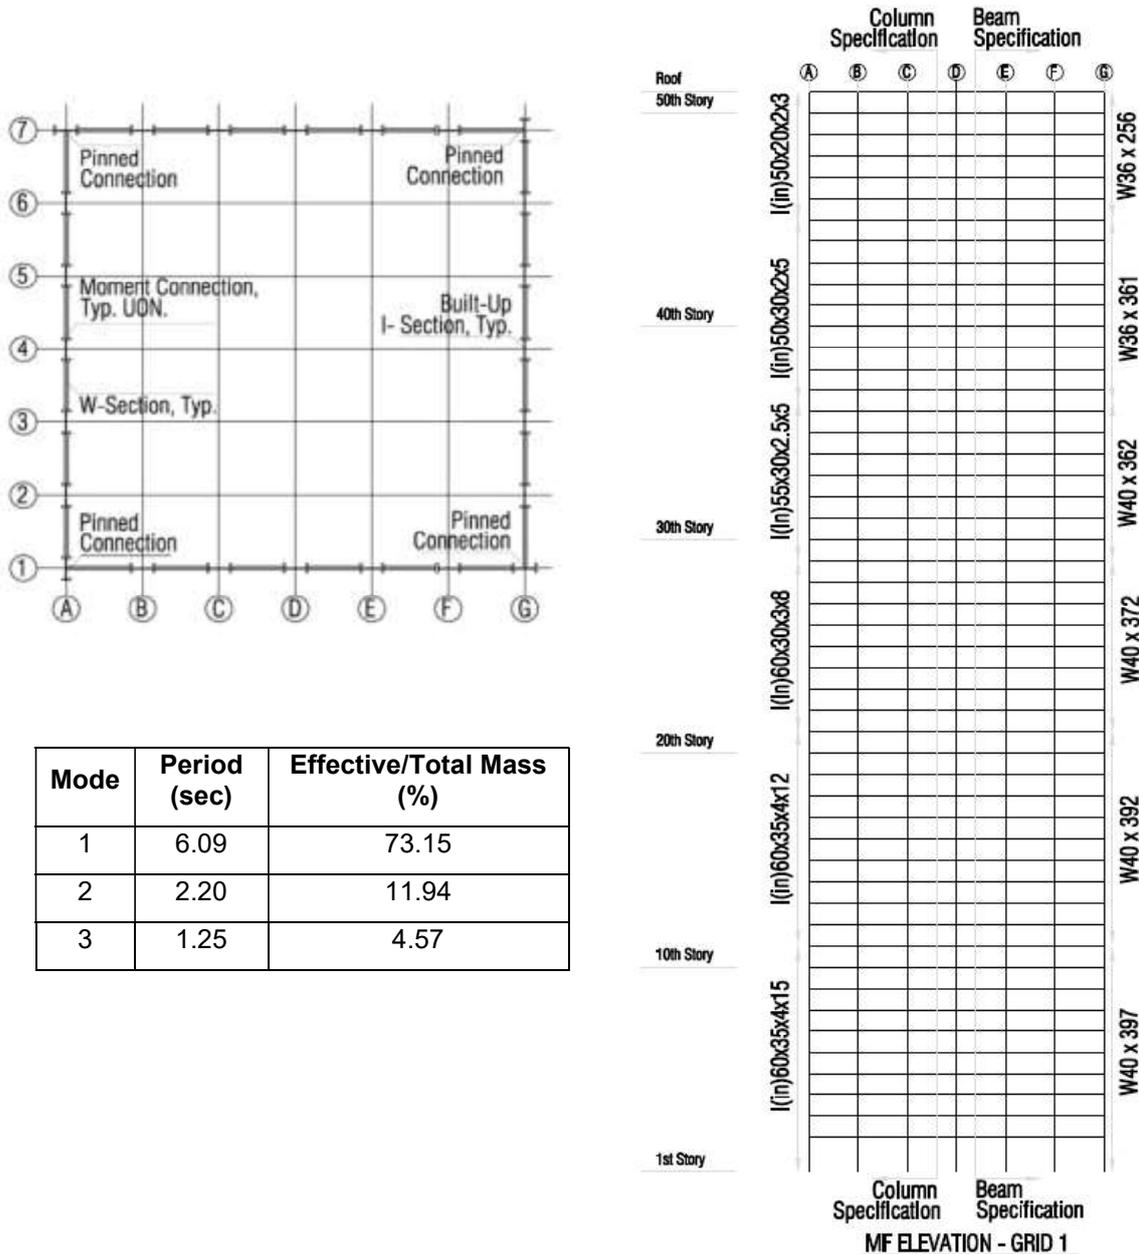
Archetype 50 storey perimeter steel moment frame office building: (a) plan, (b) elevation (illustrating key beam and column sizes up the building height) and (c) summary of the dynamic properties of the archetype building in one of its principal building directions.
